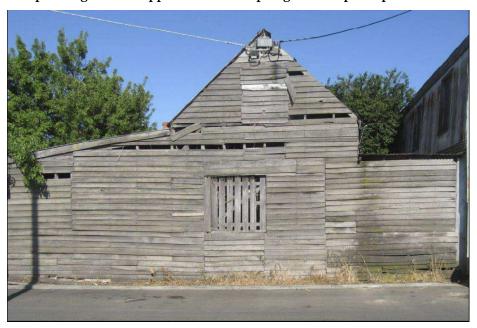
A timber outbuilding remains on the east boundary, which is an early stable (date not confirmed). It has a gabled roof with a filled in opening in the gable end, and another one below, and skillion additions off the long elevations.
